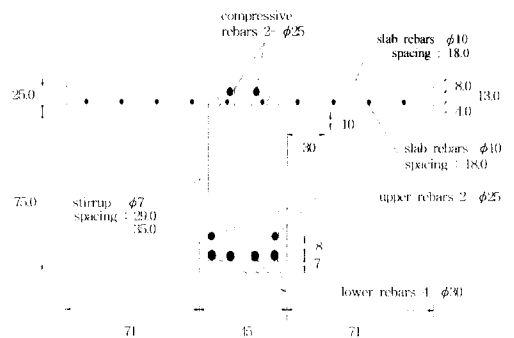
Reinforcement layout of a T-girder (unit : cm)
